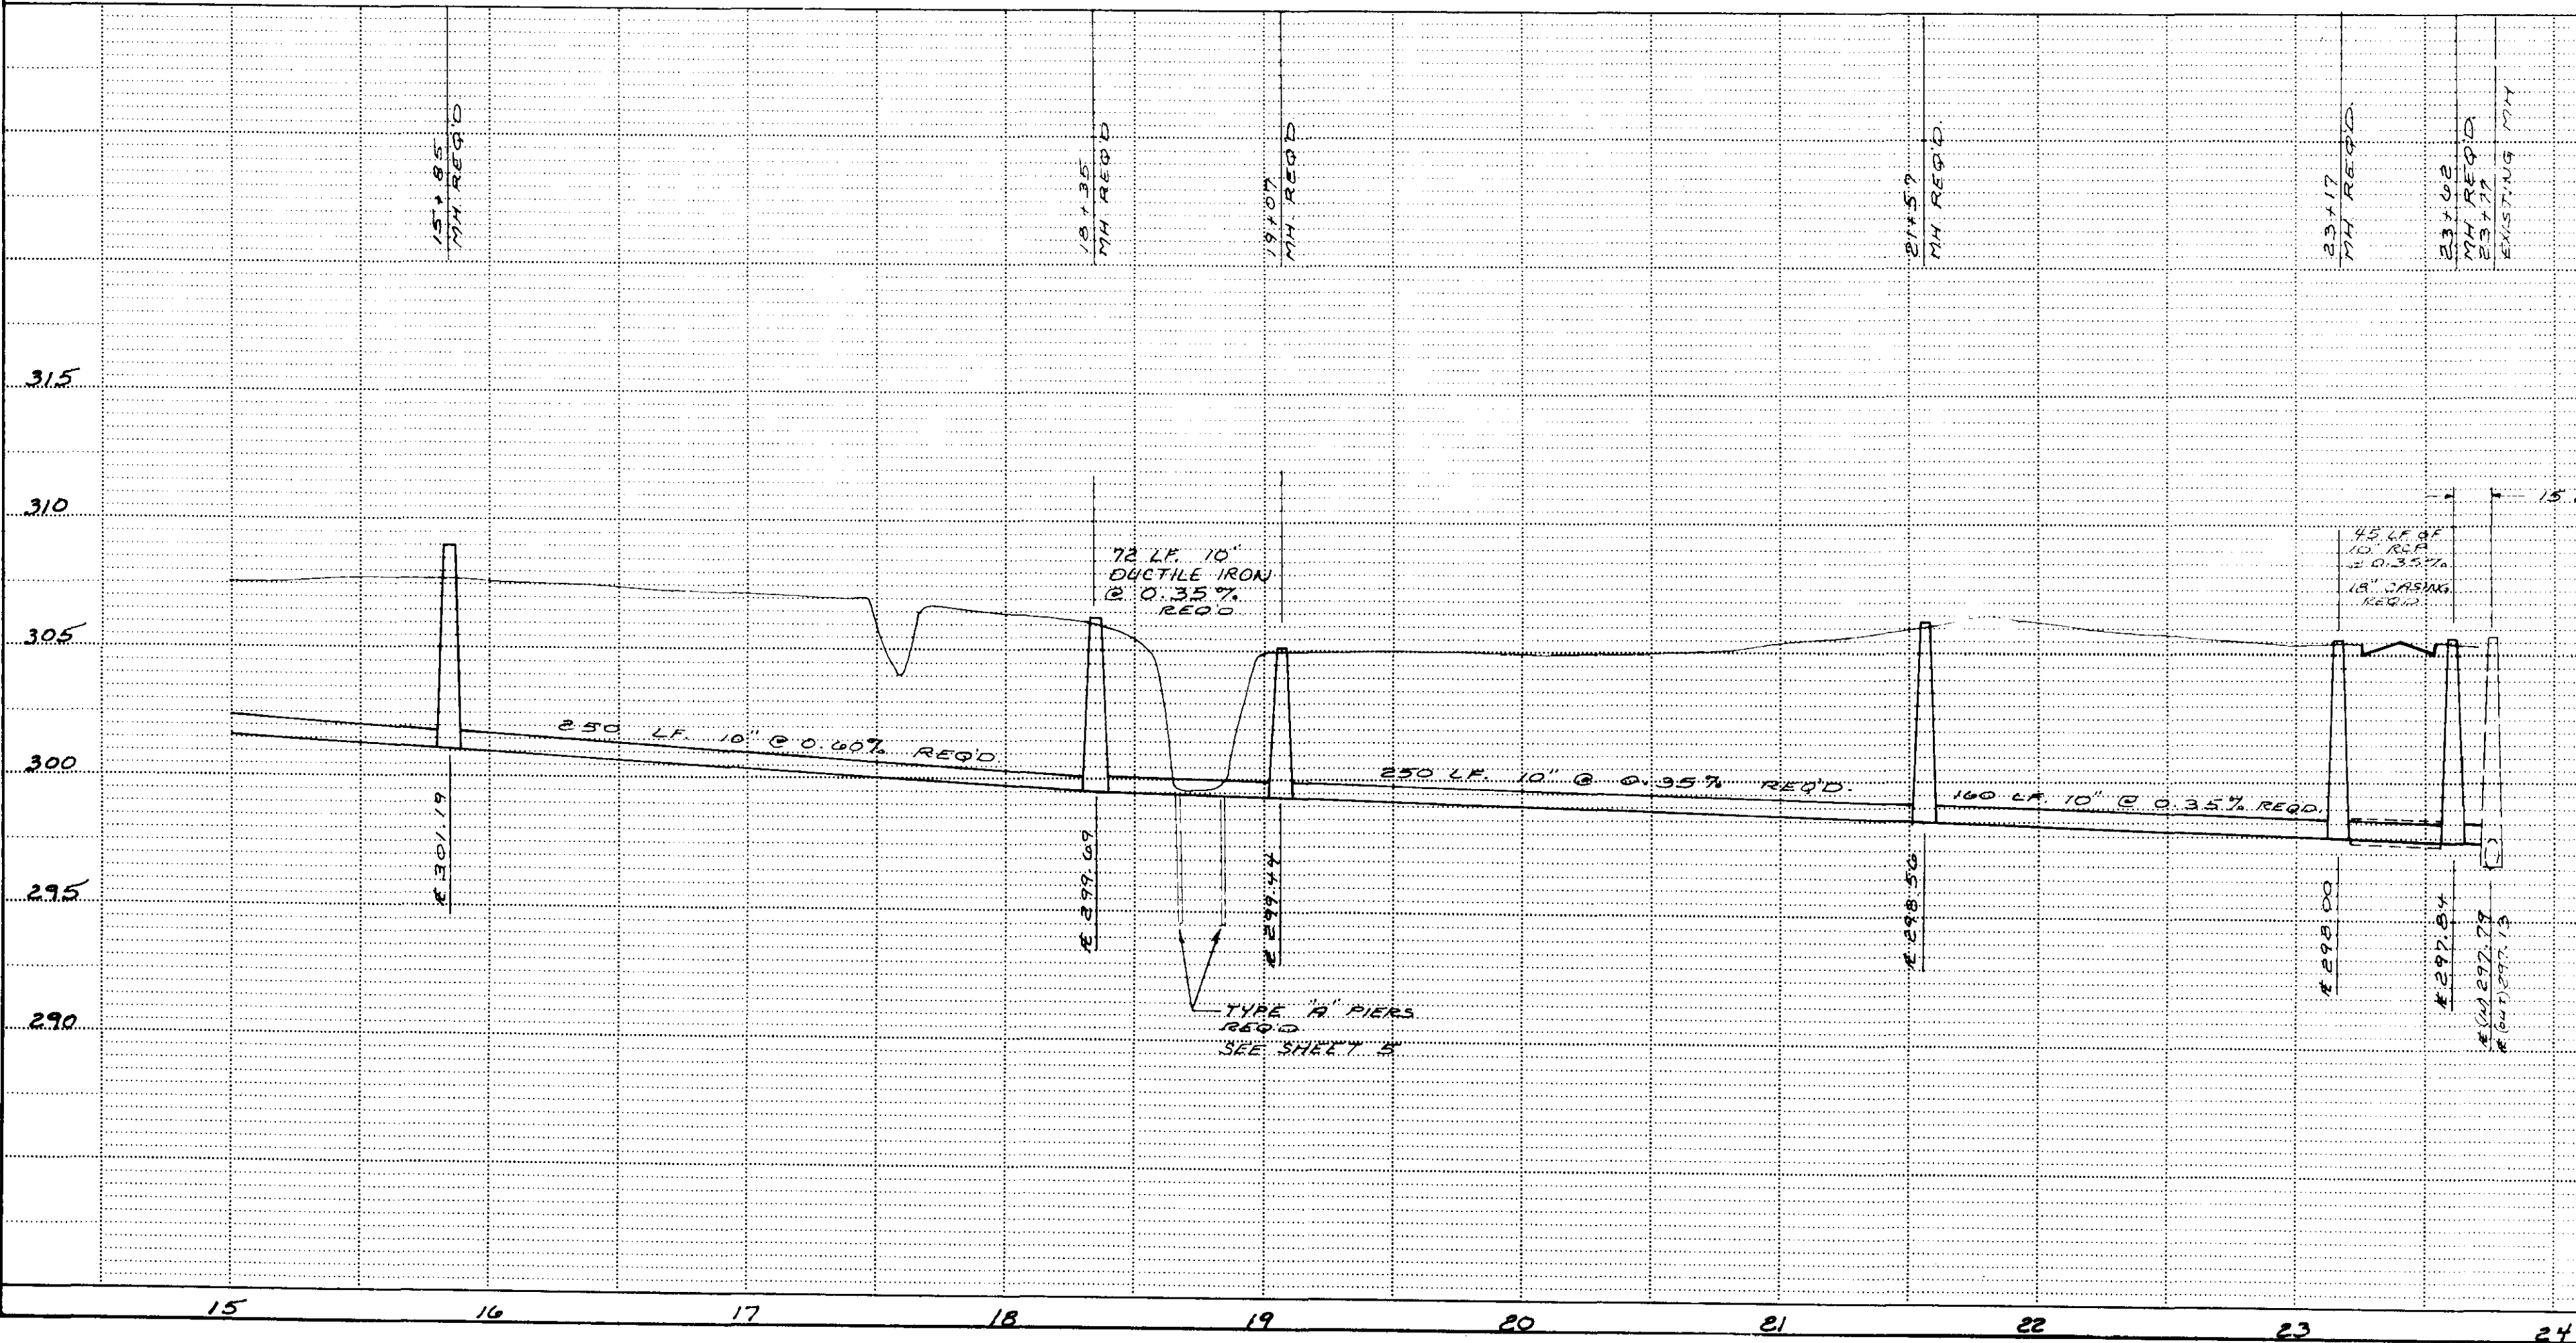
SINGLE PLAN AND PROFILE FULL DOT
